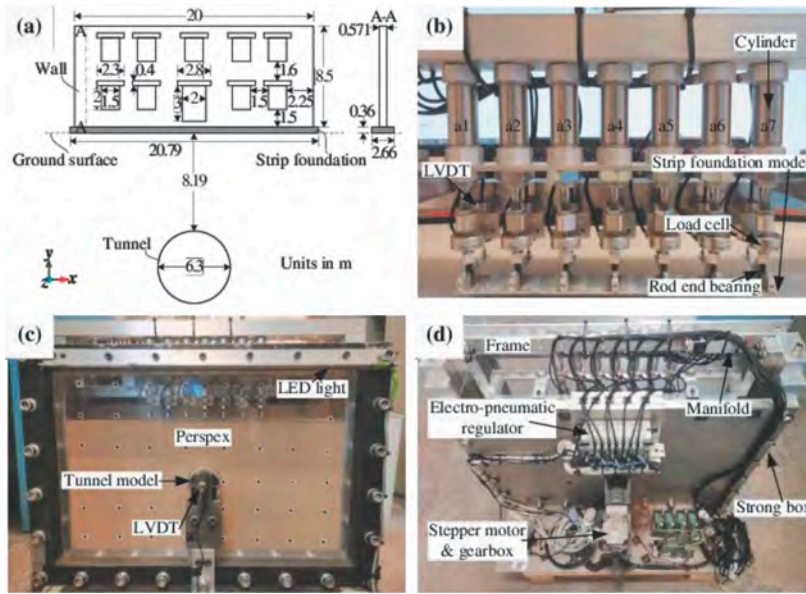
(a) Layout of prototype-scaled tunnel-strip foundation-wall, (b) loading system for strip foundation, and (c) front and (d) top views of centrifuge model.
